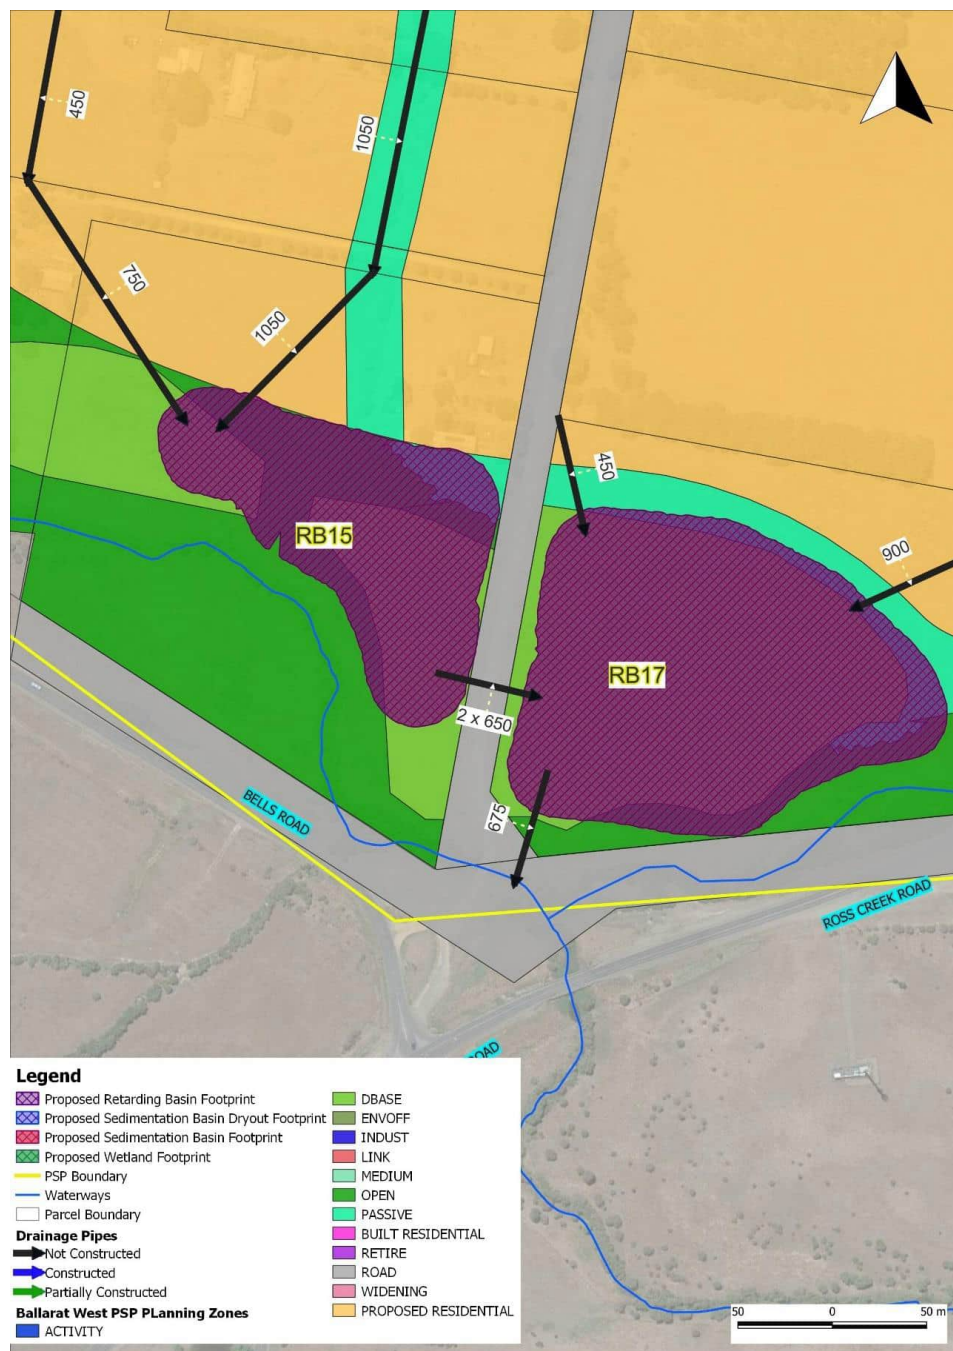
RETARDING BASIN 17 CONCEPT LAYOUT
